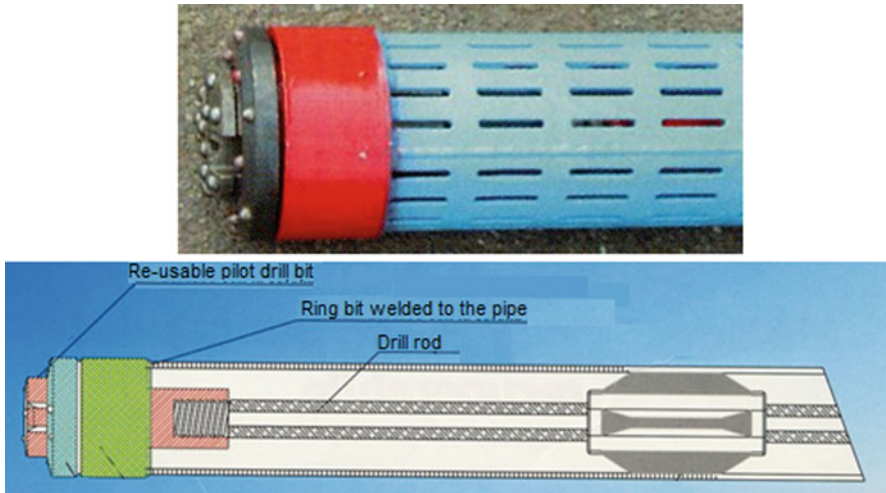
Drainage installation system during boring with partially non-retrievable drilling head
